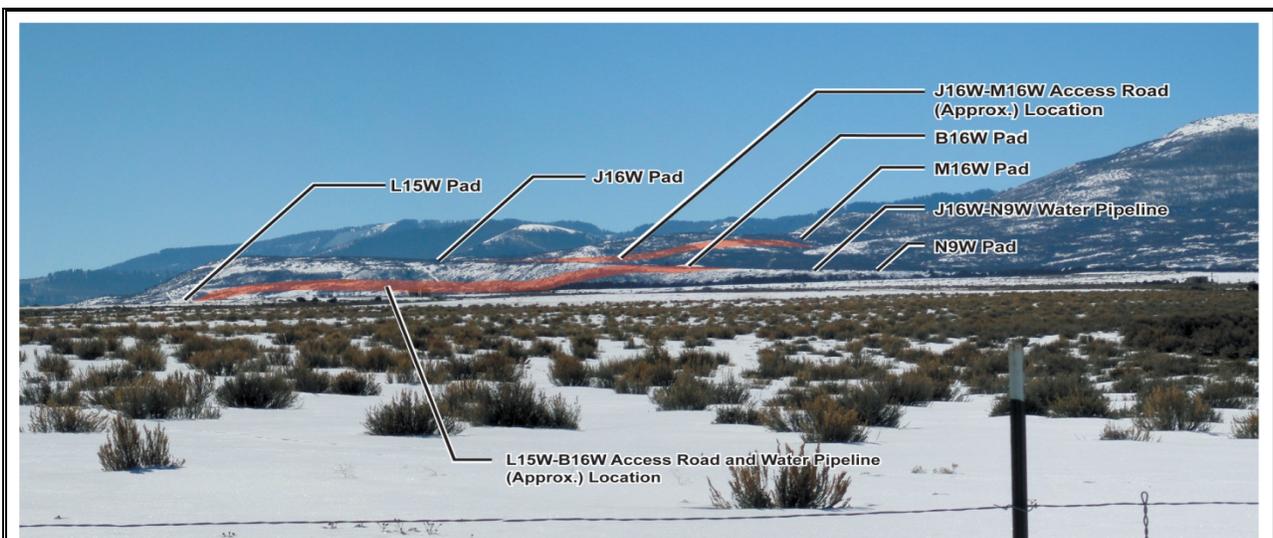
KOP 3 (Note: Access roads and pipeline locations are not to scale).
